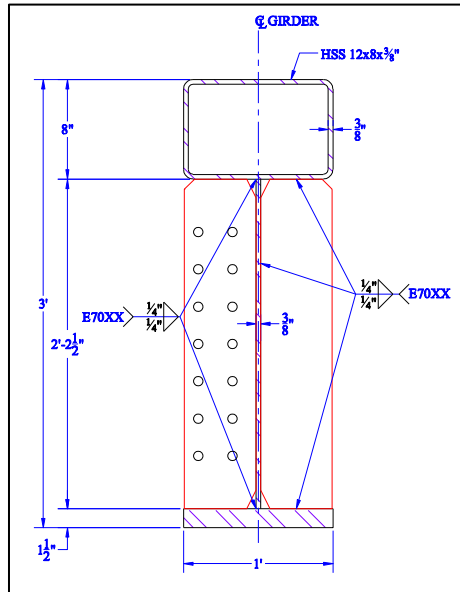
Cross section view of 2/3-scale TFG bridge (Sause et al., 2009)
